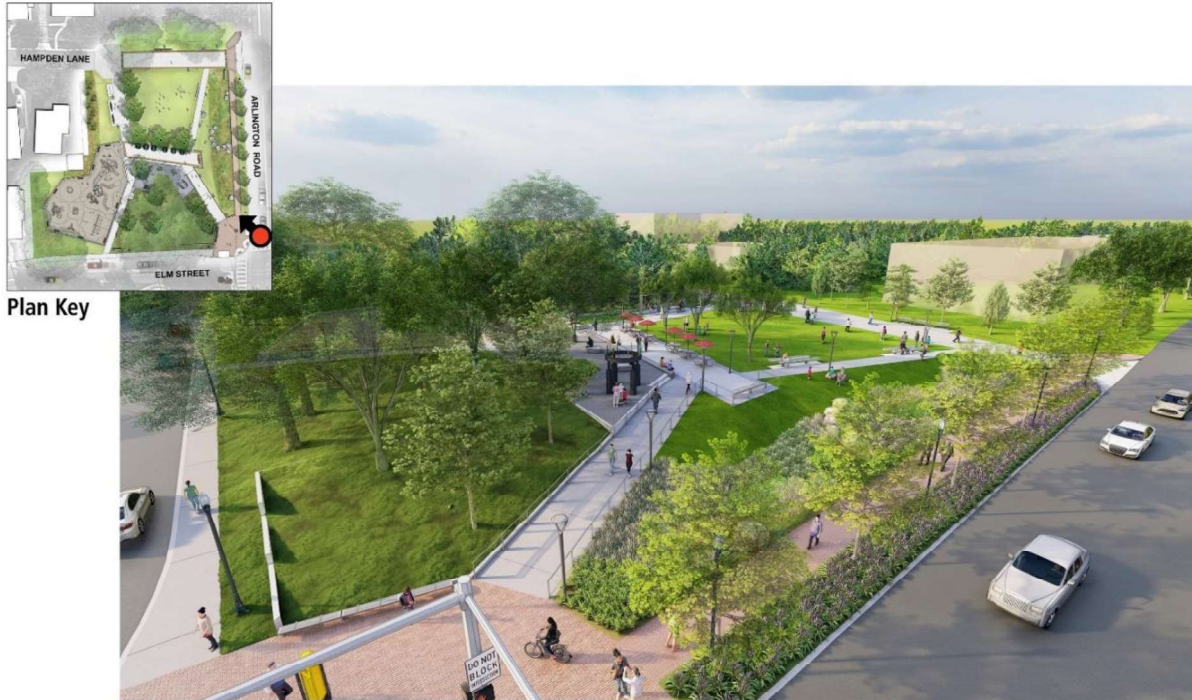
Proposed Renovation, Caroline Freeland Park (view to northwest)
